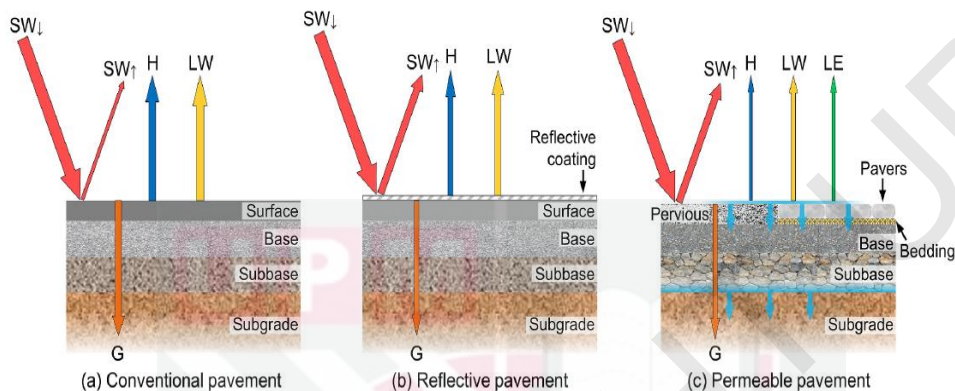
Structures of Pavement Types (C. Wang et al., 2021a)
